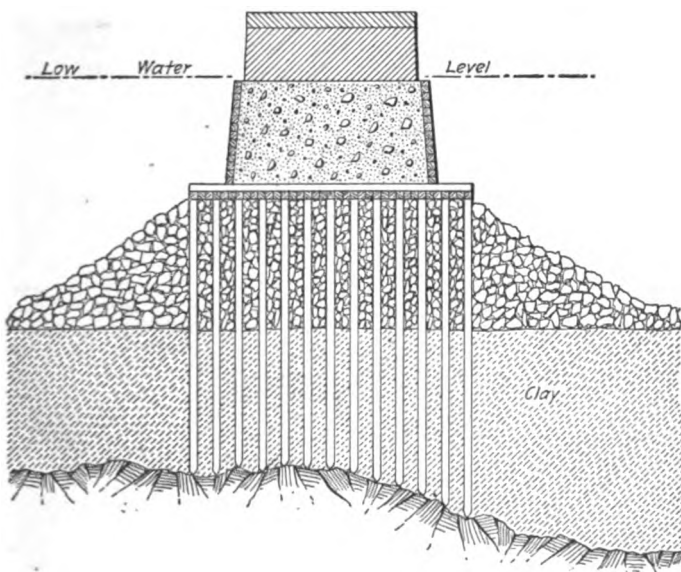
PILE AND CRIB FOUNDATION FOR A BRIDGE PIER.
